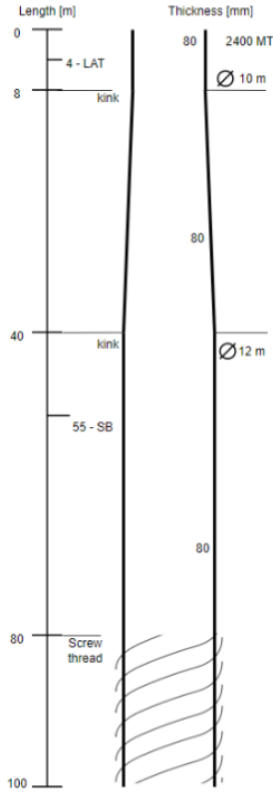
Final design of the monopile including the dimensions and the screw thread.
